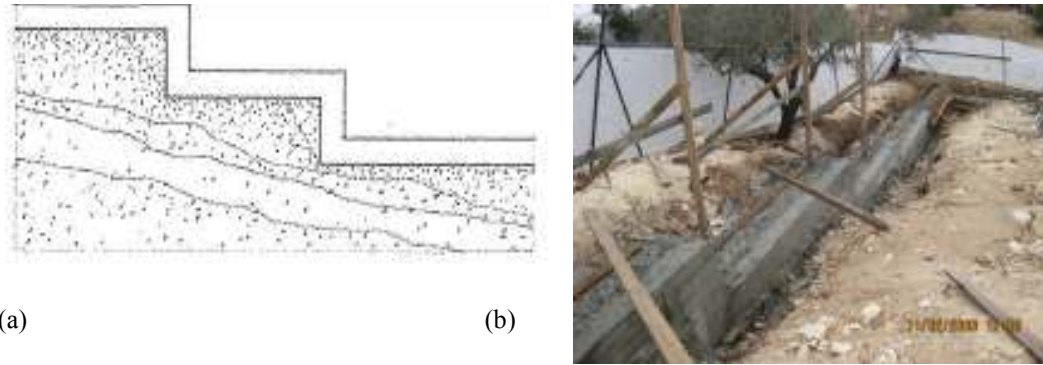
(a) A section in a Stepped footing, (b) Photo of a stepped footing in the West bank
